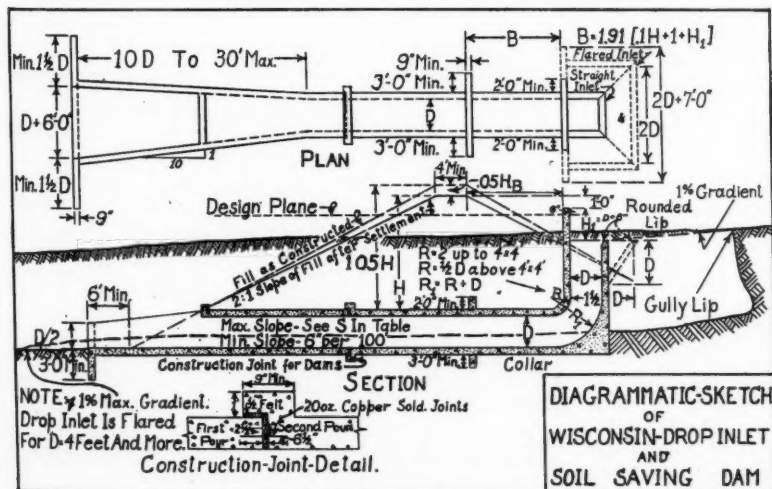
STANDARD RECOMMENDATION FOR A DROP-INLET SOIL SAVING DAM
